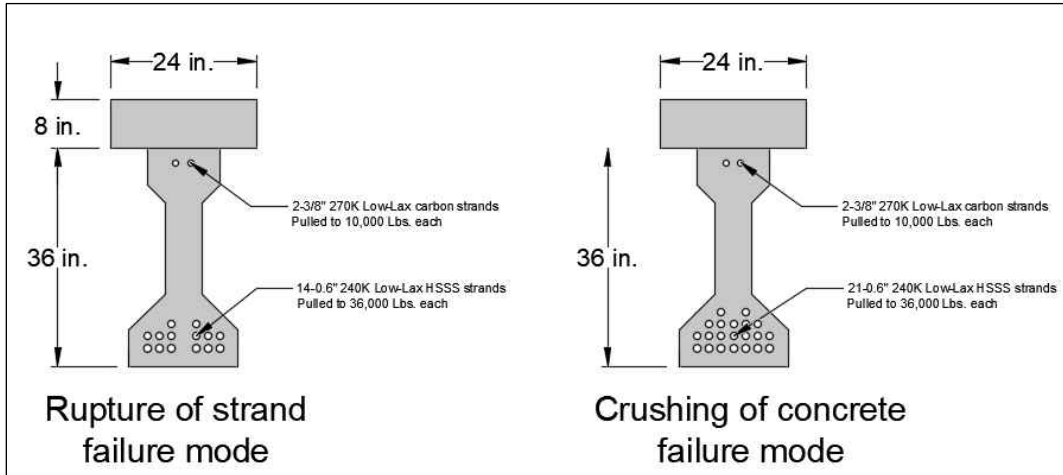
Cross sections of two girders: 14 HSSSS strands with rupture of strands failure and 21 HSSSS strands with crushing of concrete failure
